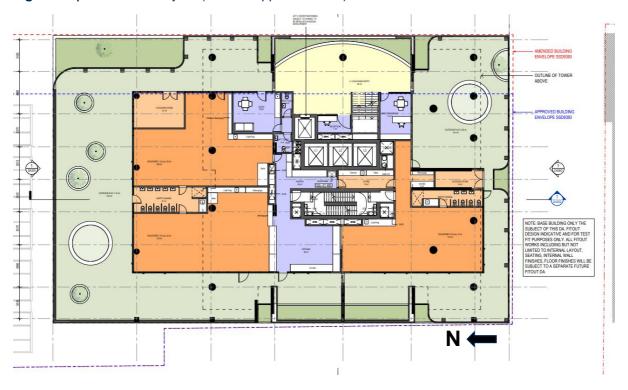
| First floor showing community facility layout (source: Applicant's RtS)
